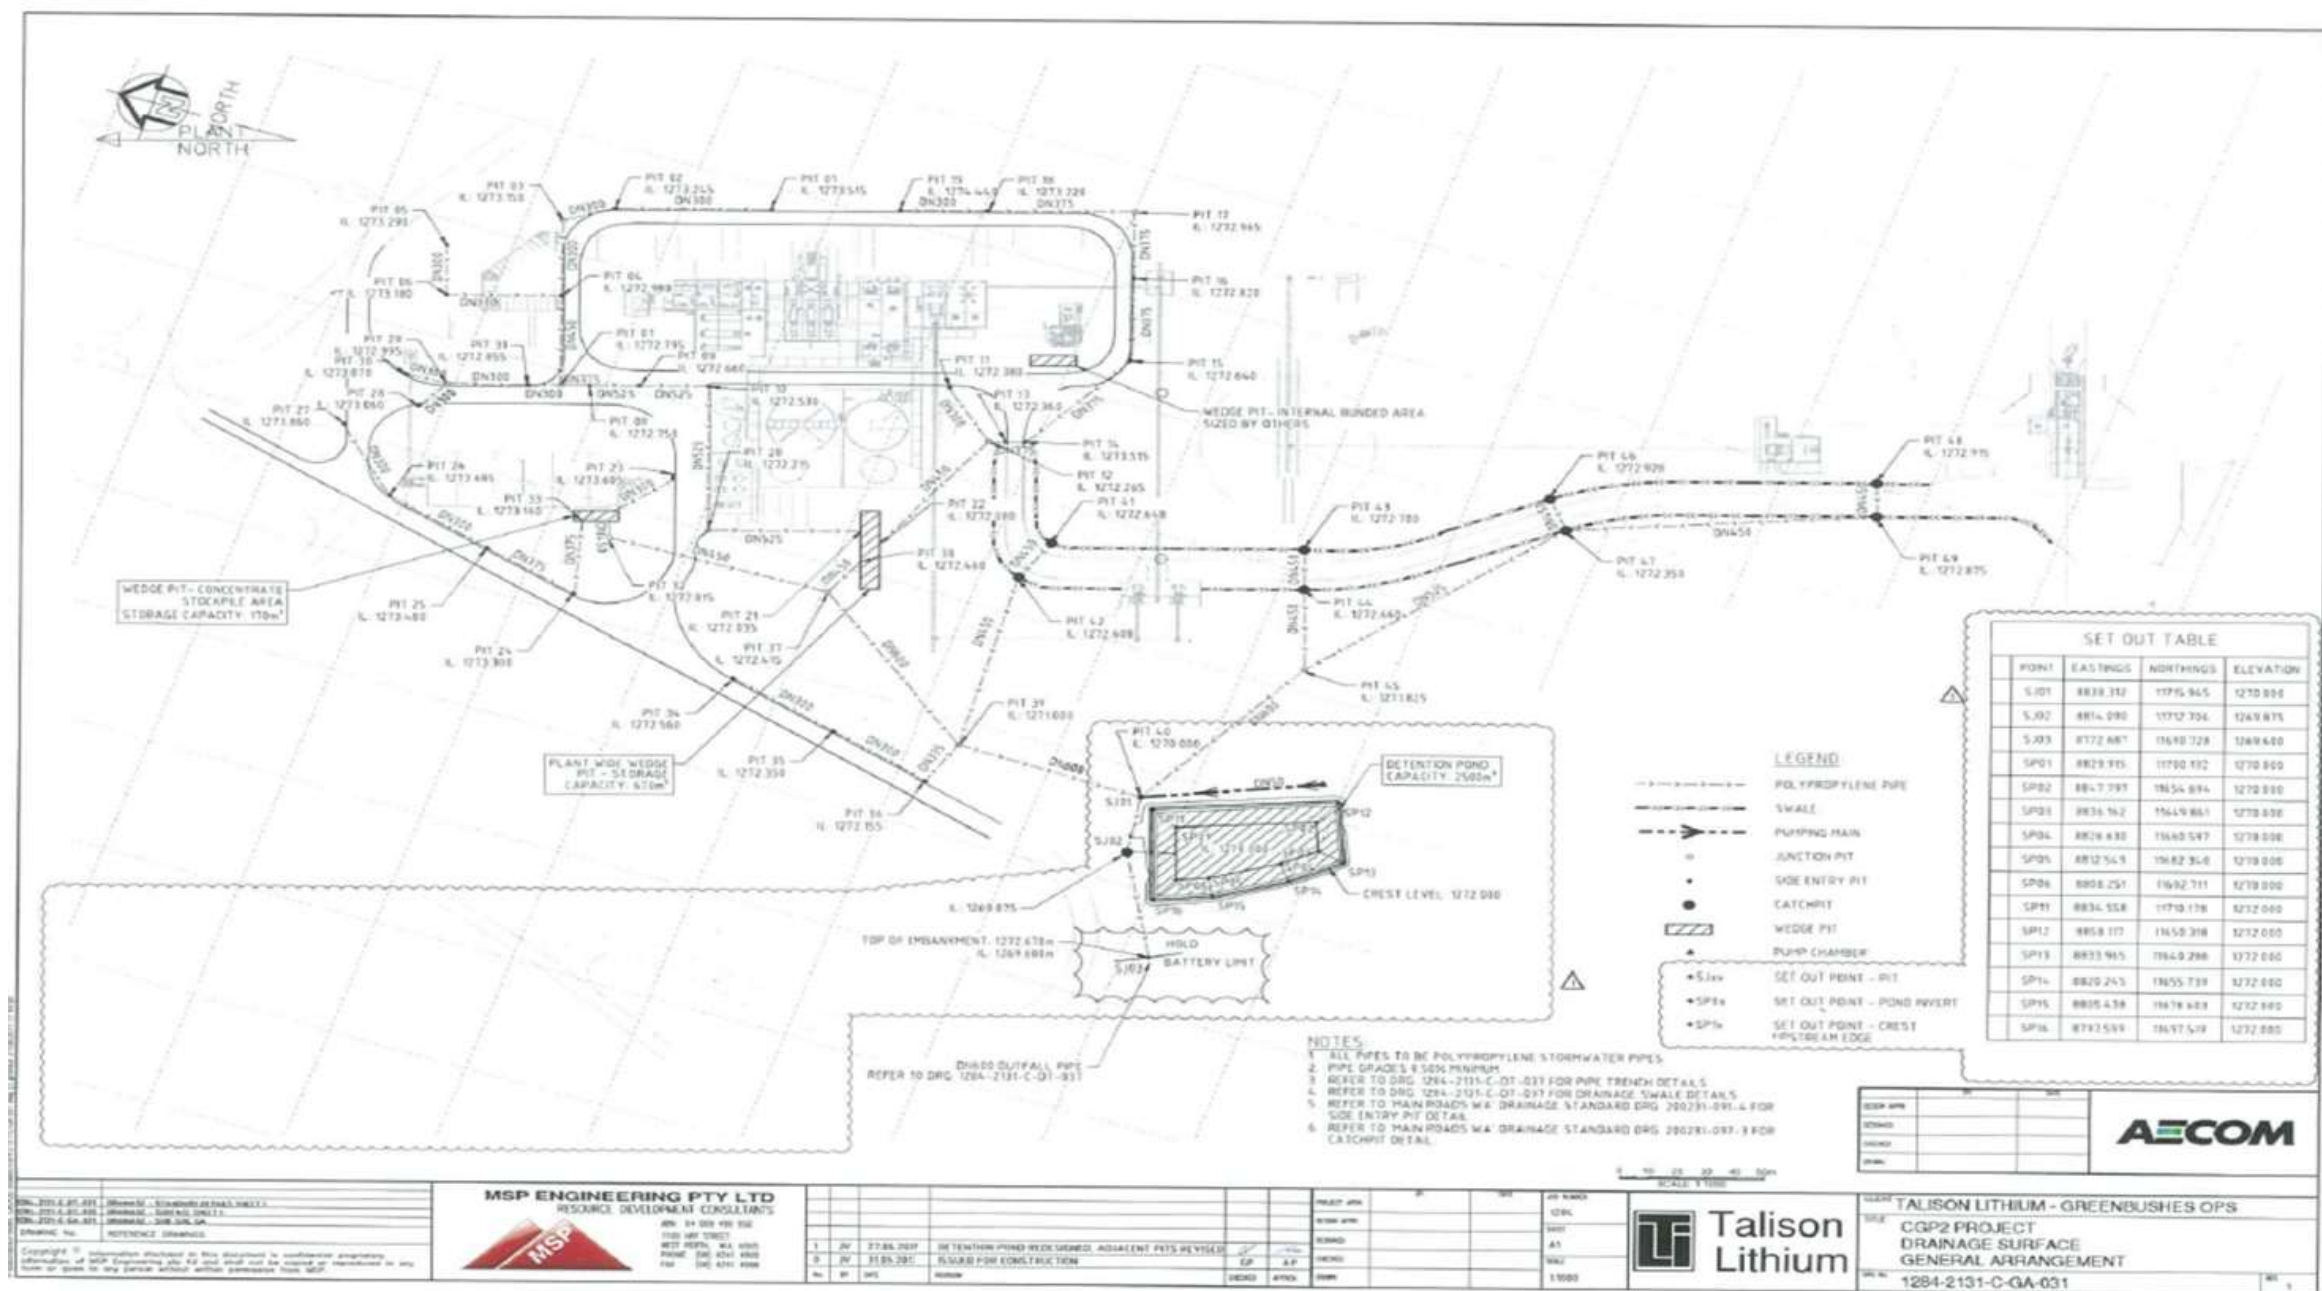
Surface stormwater drainage plan - Chemical Grade Processing Plant
